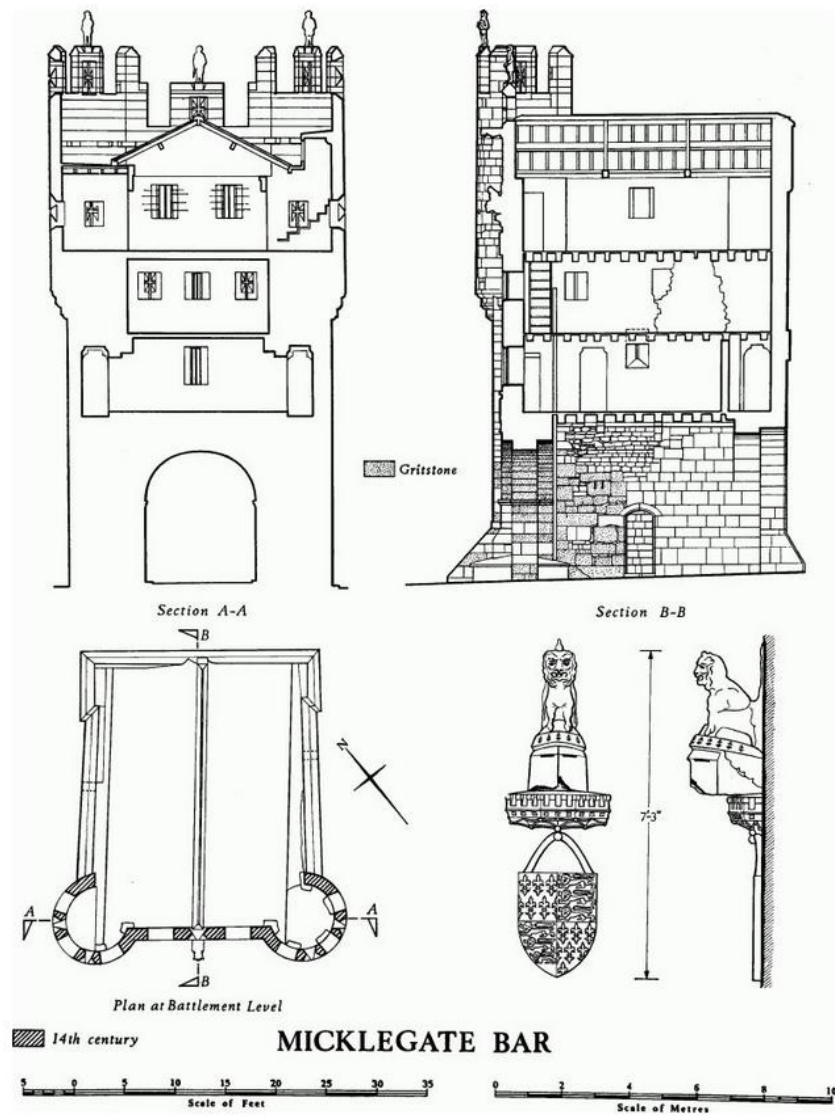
Cross sections of the building showing the roof and room space on the third floor, also depicting the roof plan (RCHME 1972)
